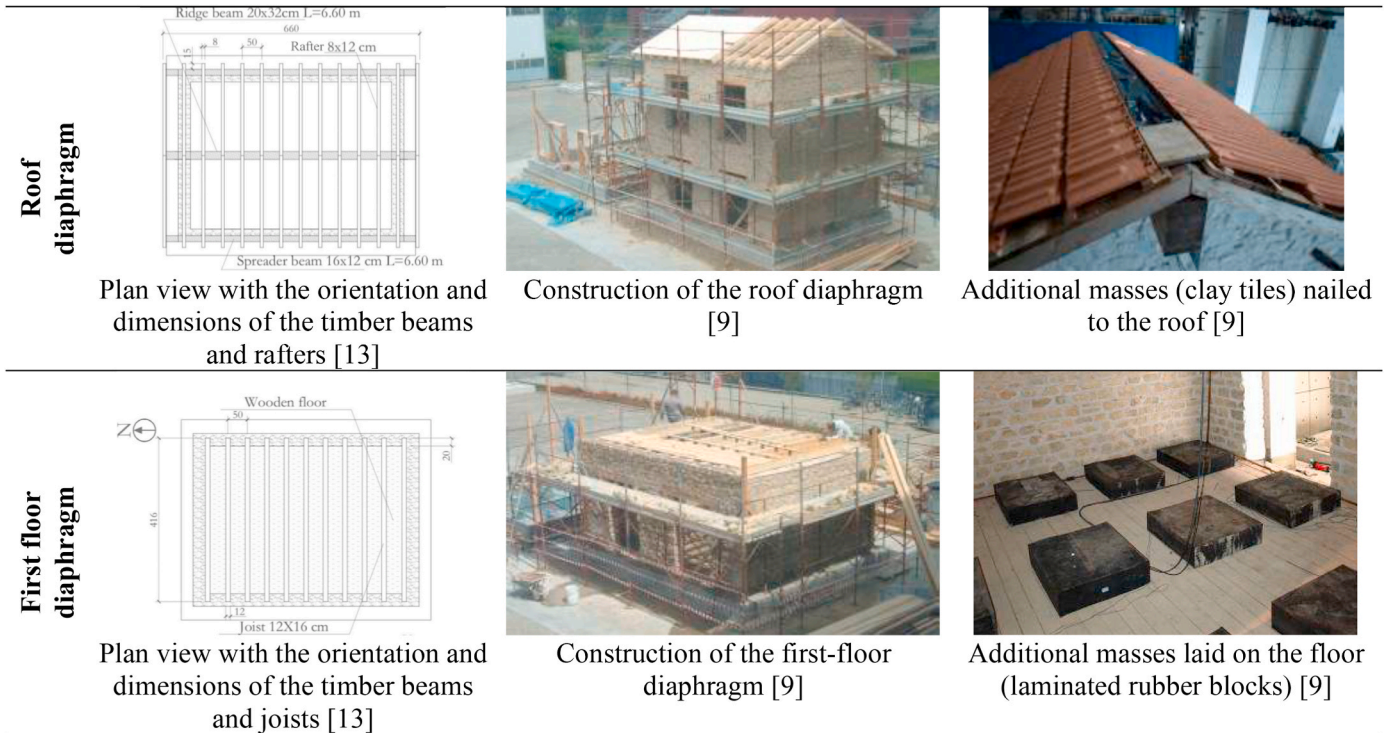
Construction details of the first floor and roof levels of Building 1.
